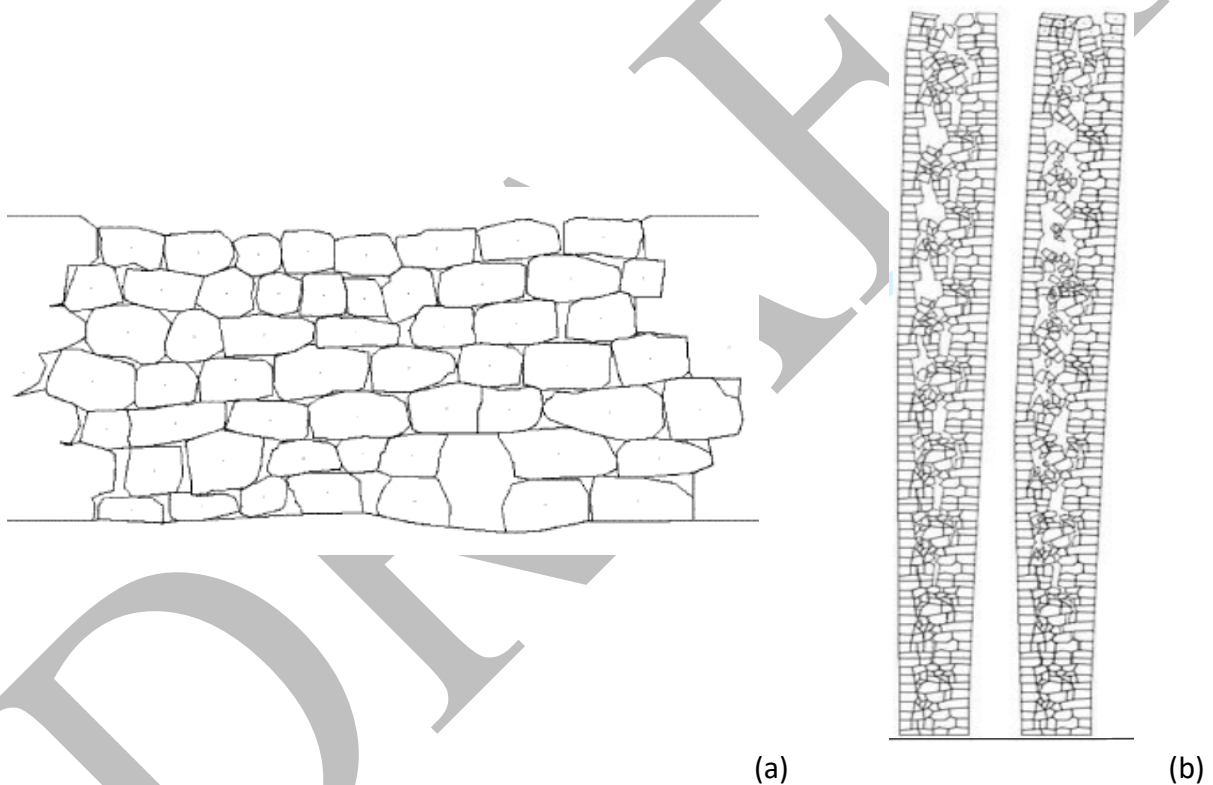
Examples of irregular dry stone external leaf modeling using discrete elements (Roberti and Spina, 2001(a) and De Felice, 2011 (b))
